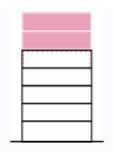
Pakhuis Meesteren, Rotterdam[9]
